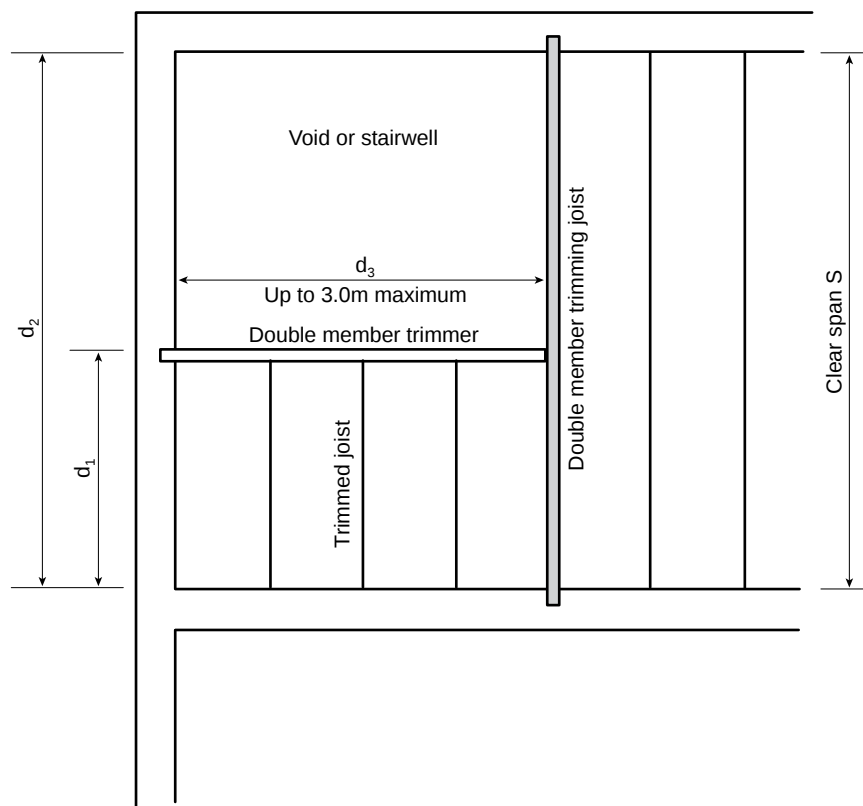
Plan on double member trimming joist supporting double member trimmer
